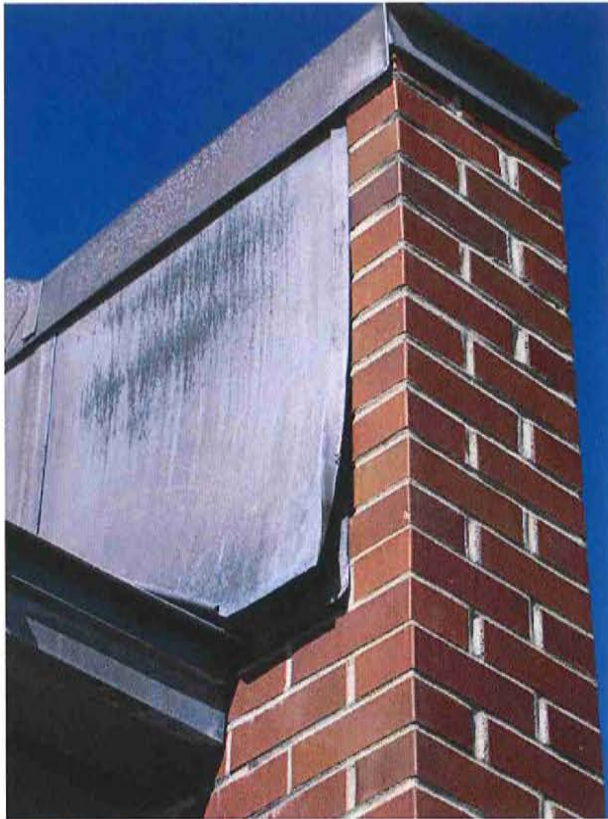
Lab/Admin - NE corner showing metal flashing bottom seam unfolded and flashing warping out and away from brick veneer, permitting water entry.
